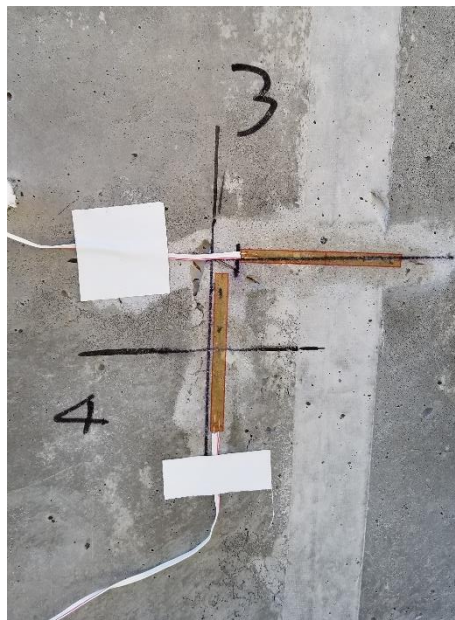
Concrete strain gages (3 and 4) adhered to concrete railing surface
